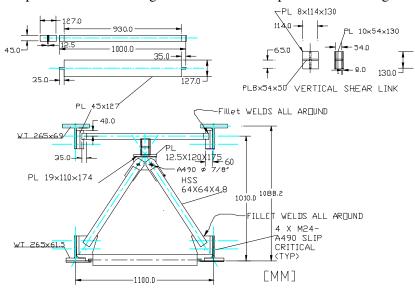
Eccentrically Braced Frame (EBF) retrofit details- End Panel
